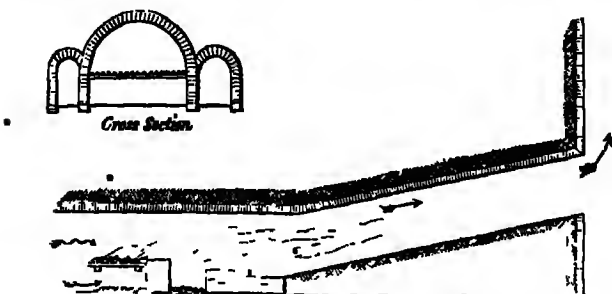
Ventilating furnace, in longitudinal and cross section Scale, $\frac{1}{4}$ -inch to 1 foot
